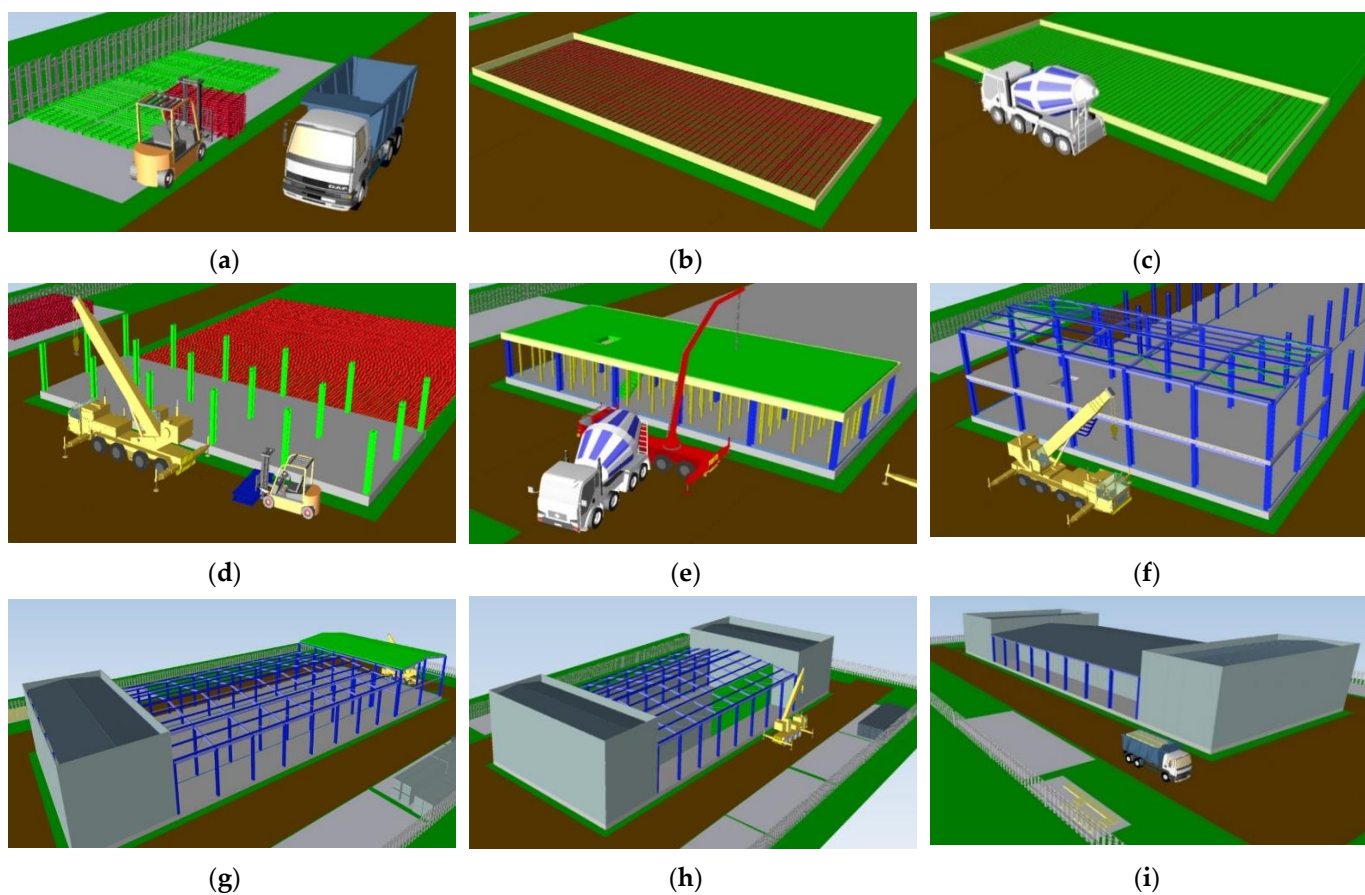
Short clips from the 4D simulation footage: (a) Reinforcement delivery and unloading; (b) Reinforcement installation (offices—foundations slab); (c) Concrete works (offices—foundations slab); (d) Columns assembly (offices—ground floor); (e) Concrete works (offices—ground floor slab); (f) Roof bracing assembly (offices—roof); (g) Roof panels assembly (warehouse); (h) Facade panels assembly (production plant); (i) Formwork removal.
